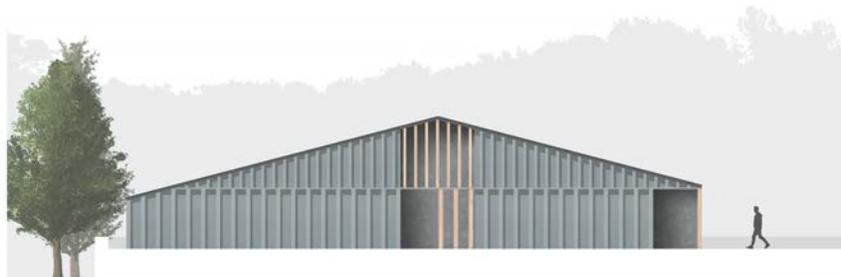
Elevation to North facing number 12 Glenlockhart Bank.
